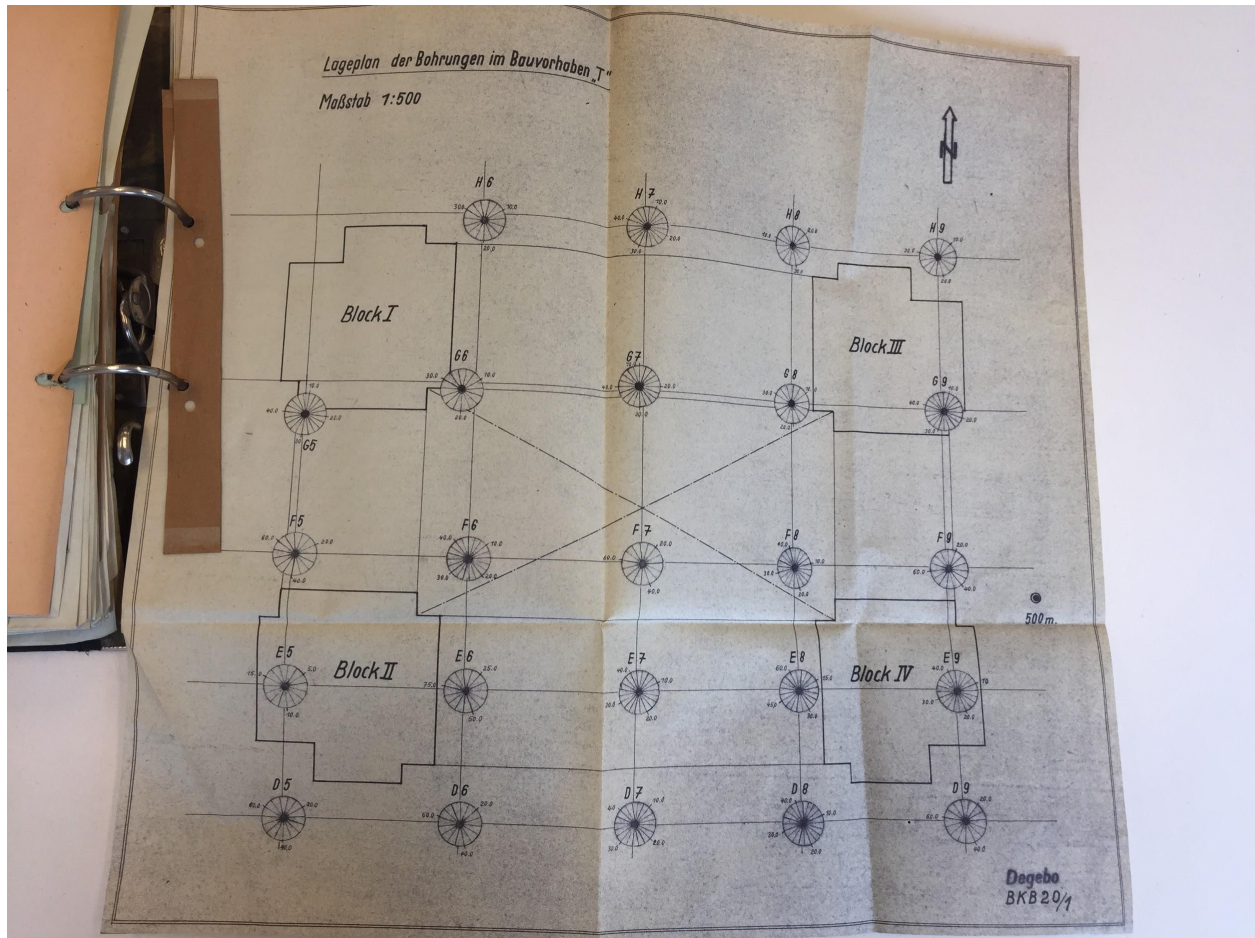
Degebo. "Lageplan der Bohrungen im Bauvorhaben 'T'." 1941. BKB 20/1, Projektarchiv Degebo, 361 BKB 15, 17, 18, 19, 20.
